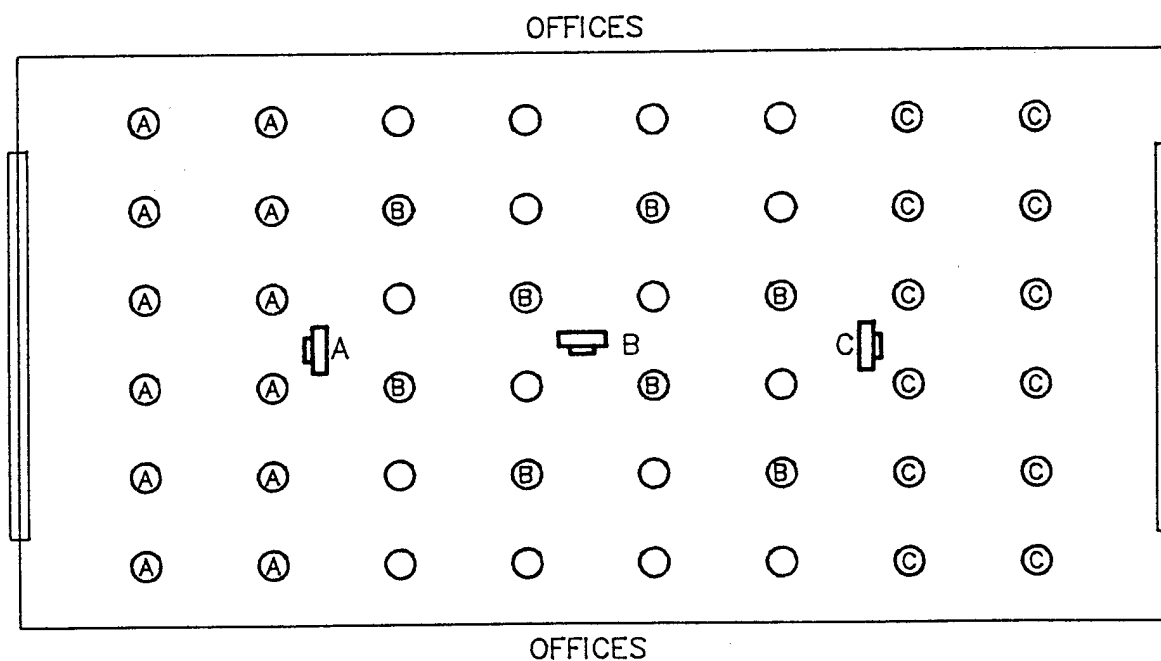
PHOTOCELL CONTROL LAYOUT - BUILDING 5222
